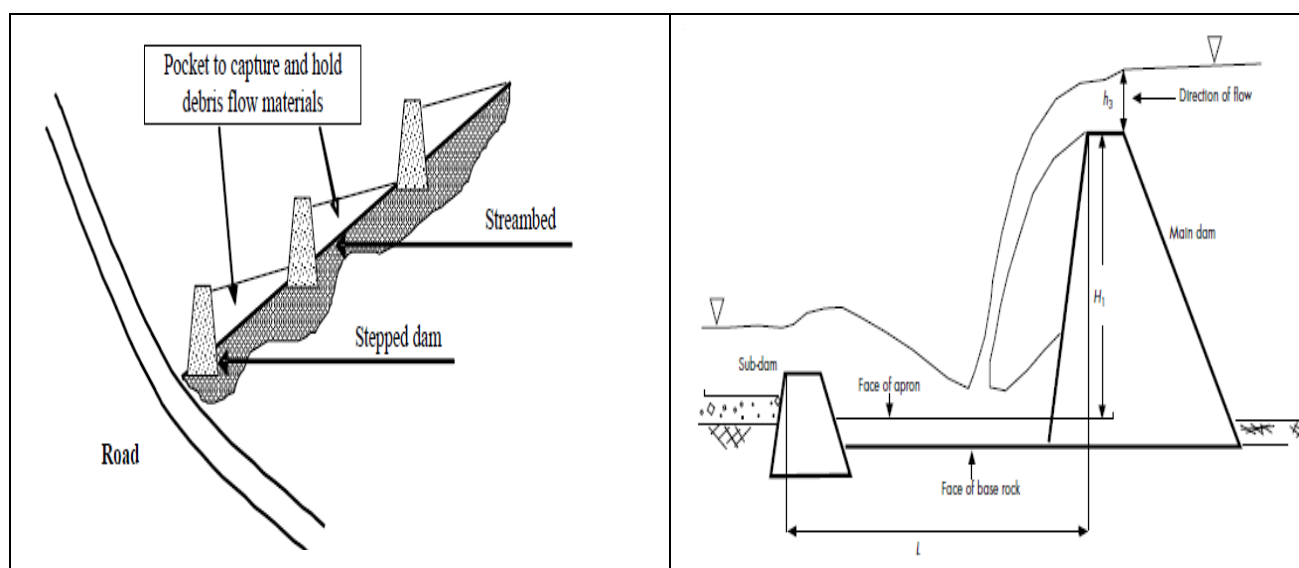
Sabo Dam (Debris Arresting Dam)
